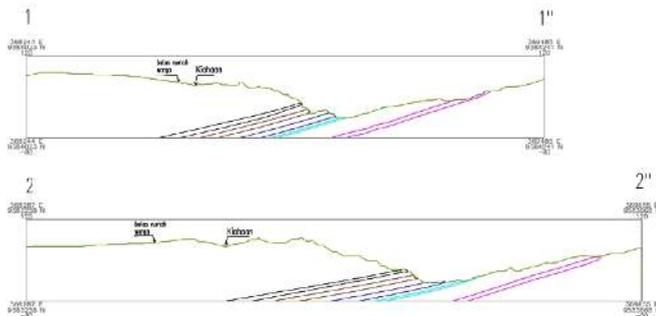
Section of Geometry Bench Pit 1 West Banko
